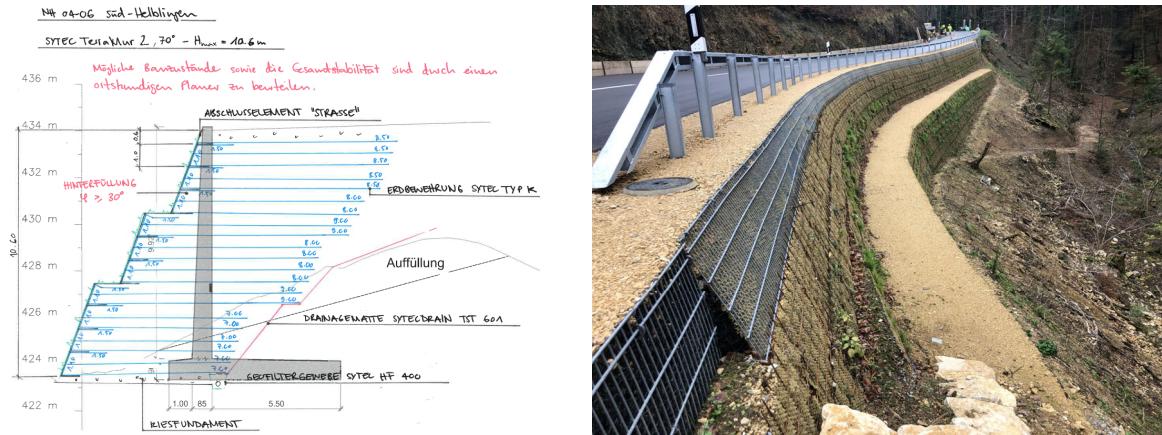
Left: Design sketch of reinforced soil retaining walls as an alternative to conventional RC walls (D. Tasevski, Emch+Berger AG Bern). Right: Photo of similar application of the TerraMur system (SYTEC AG).
